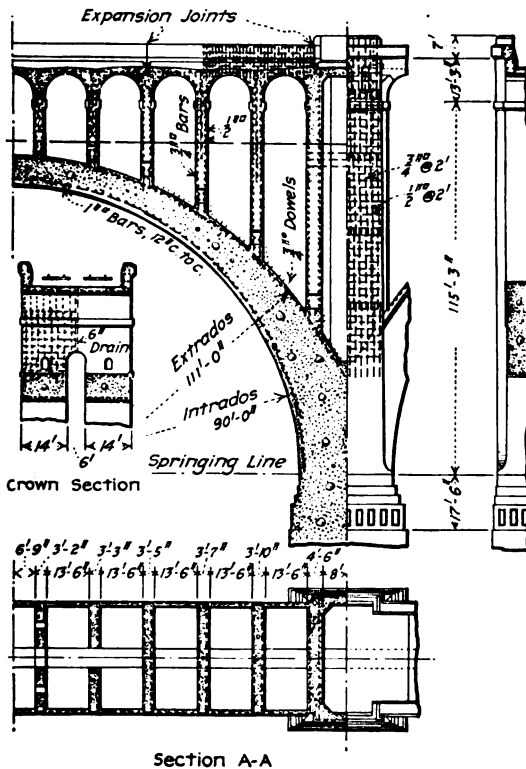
Tunkhannock viaduct. Details of 180-ft. arch spans.
